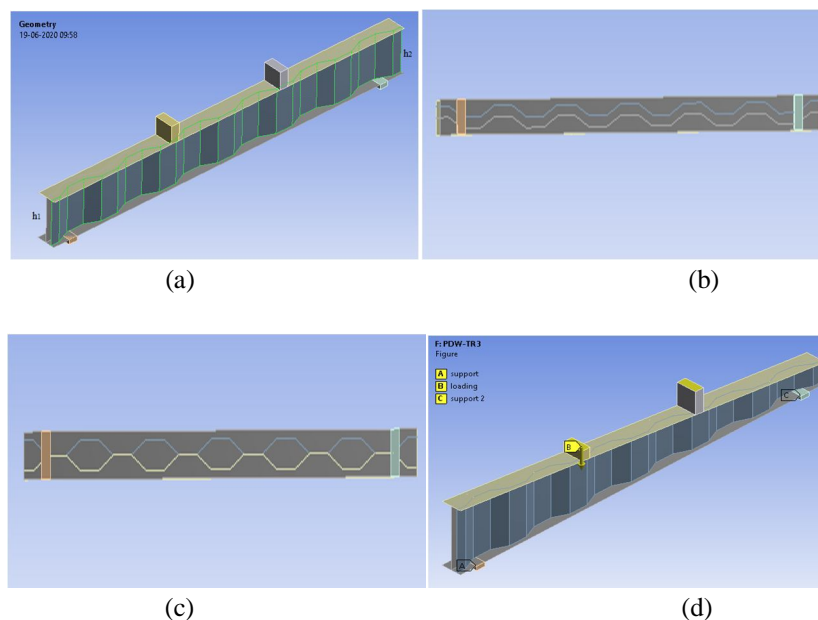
(a) Prismatic girder (b) Webs placed parallel (c) Webs placed transverse (d) Loading and Boundary condition
